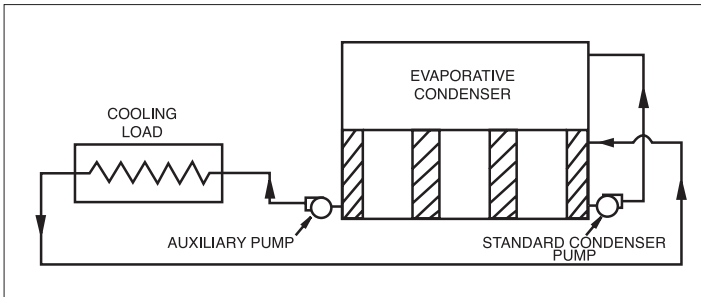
Auxiliary Cooling Using Condenser Basin Water
